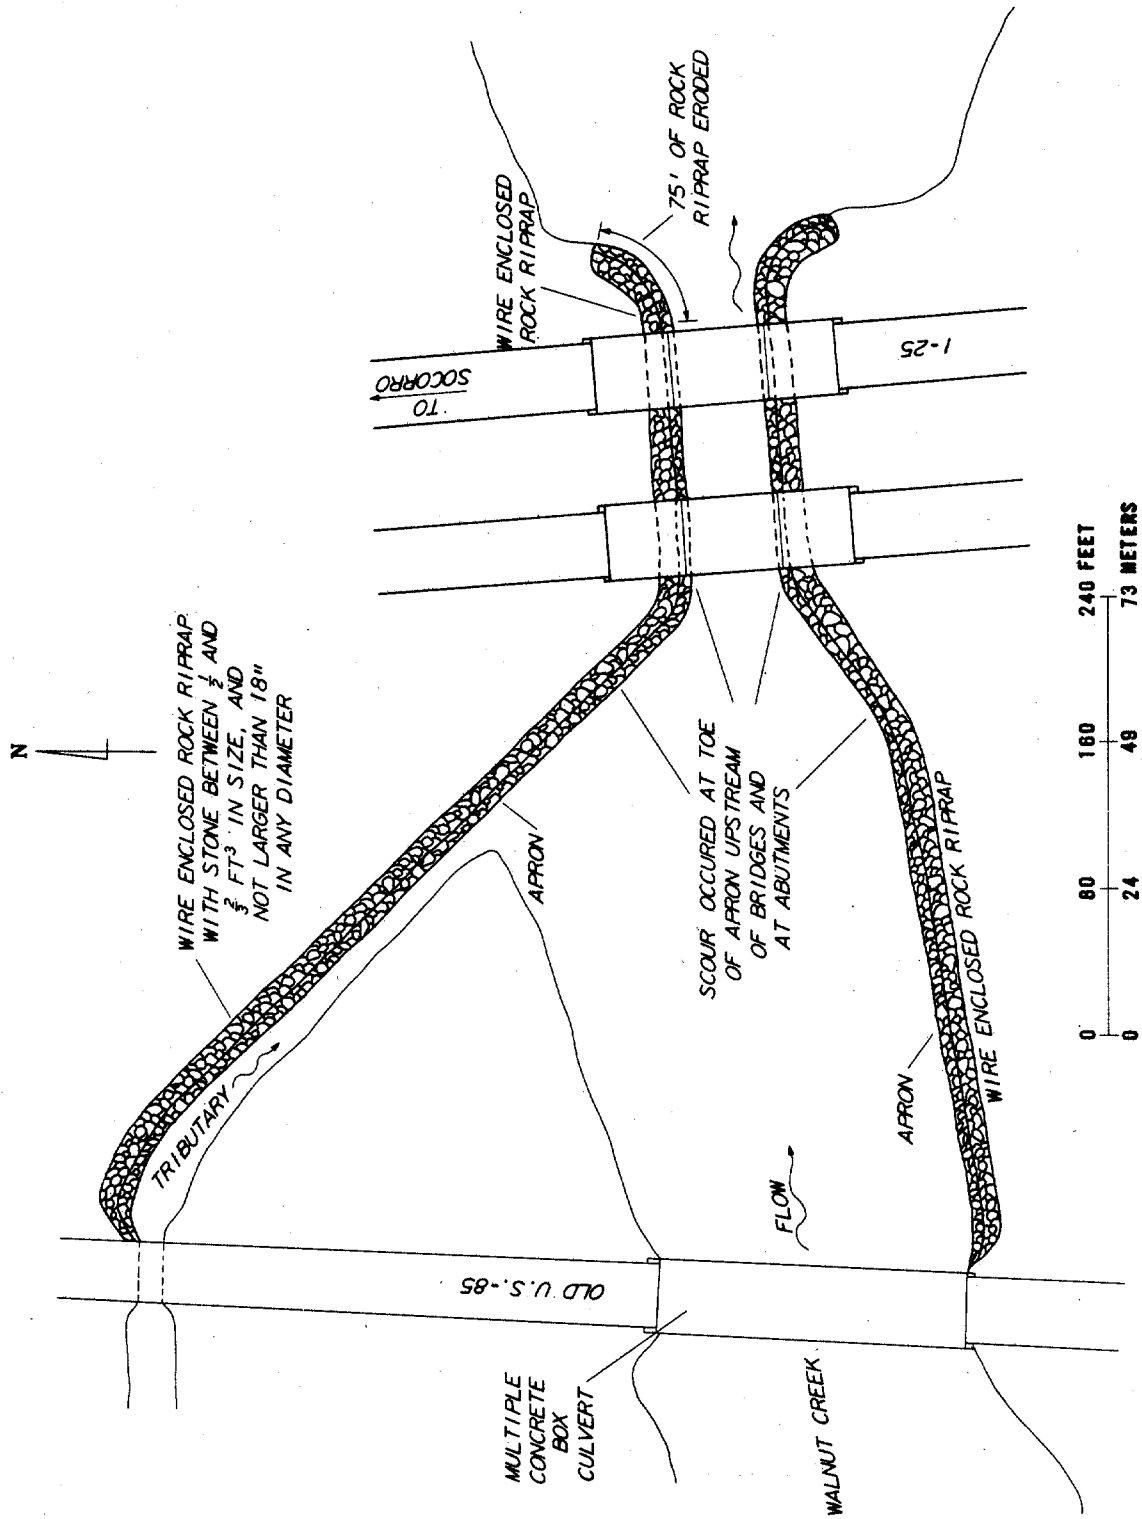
Plan of Walnut Creek at I-25 near San Antonio.
